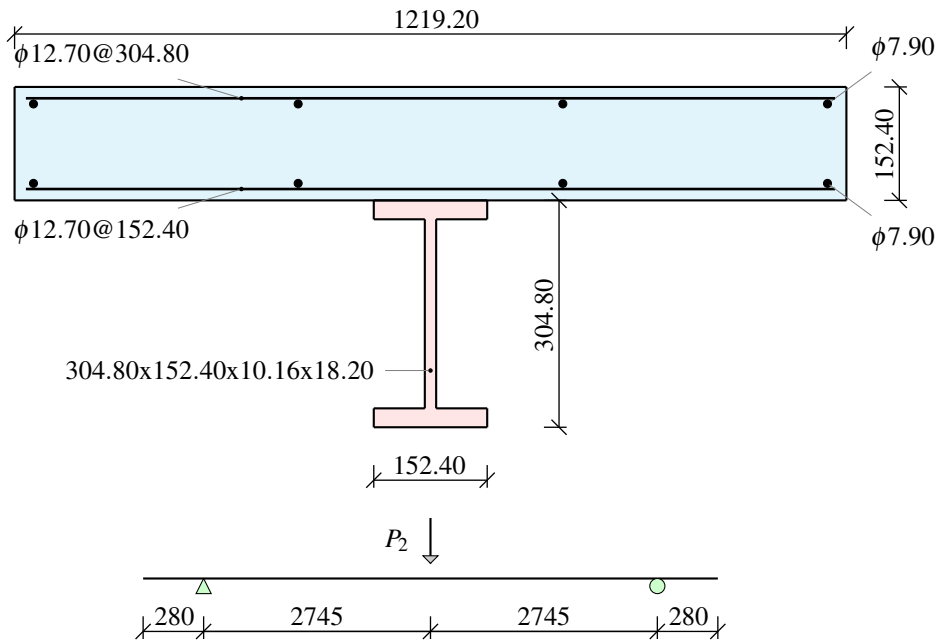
Cross-section and loading - specimen E1 (Chapman *et al.* 1964).
